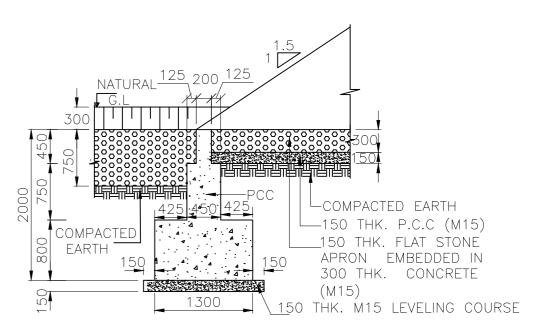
DETAIL OF CURTAIN WALL-I (DOWN STREAM SIDE)
